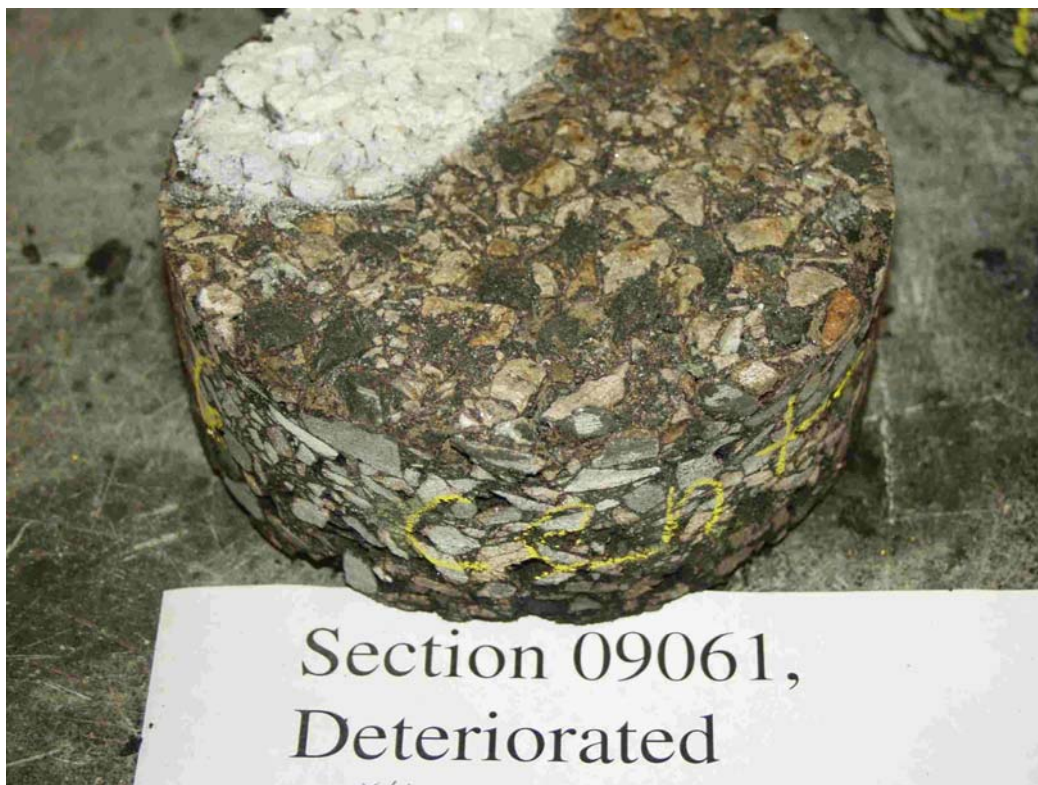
SIX-INCH PAVEMENT CORE FROM DETERIORATED PORTION OF SECTION WB 5
